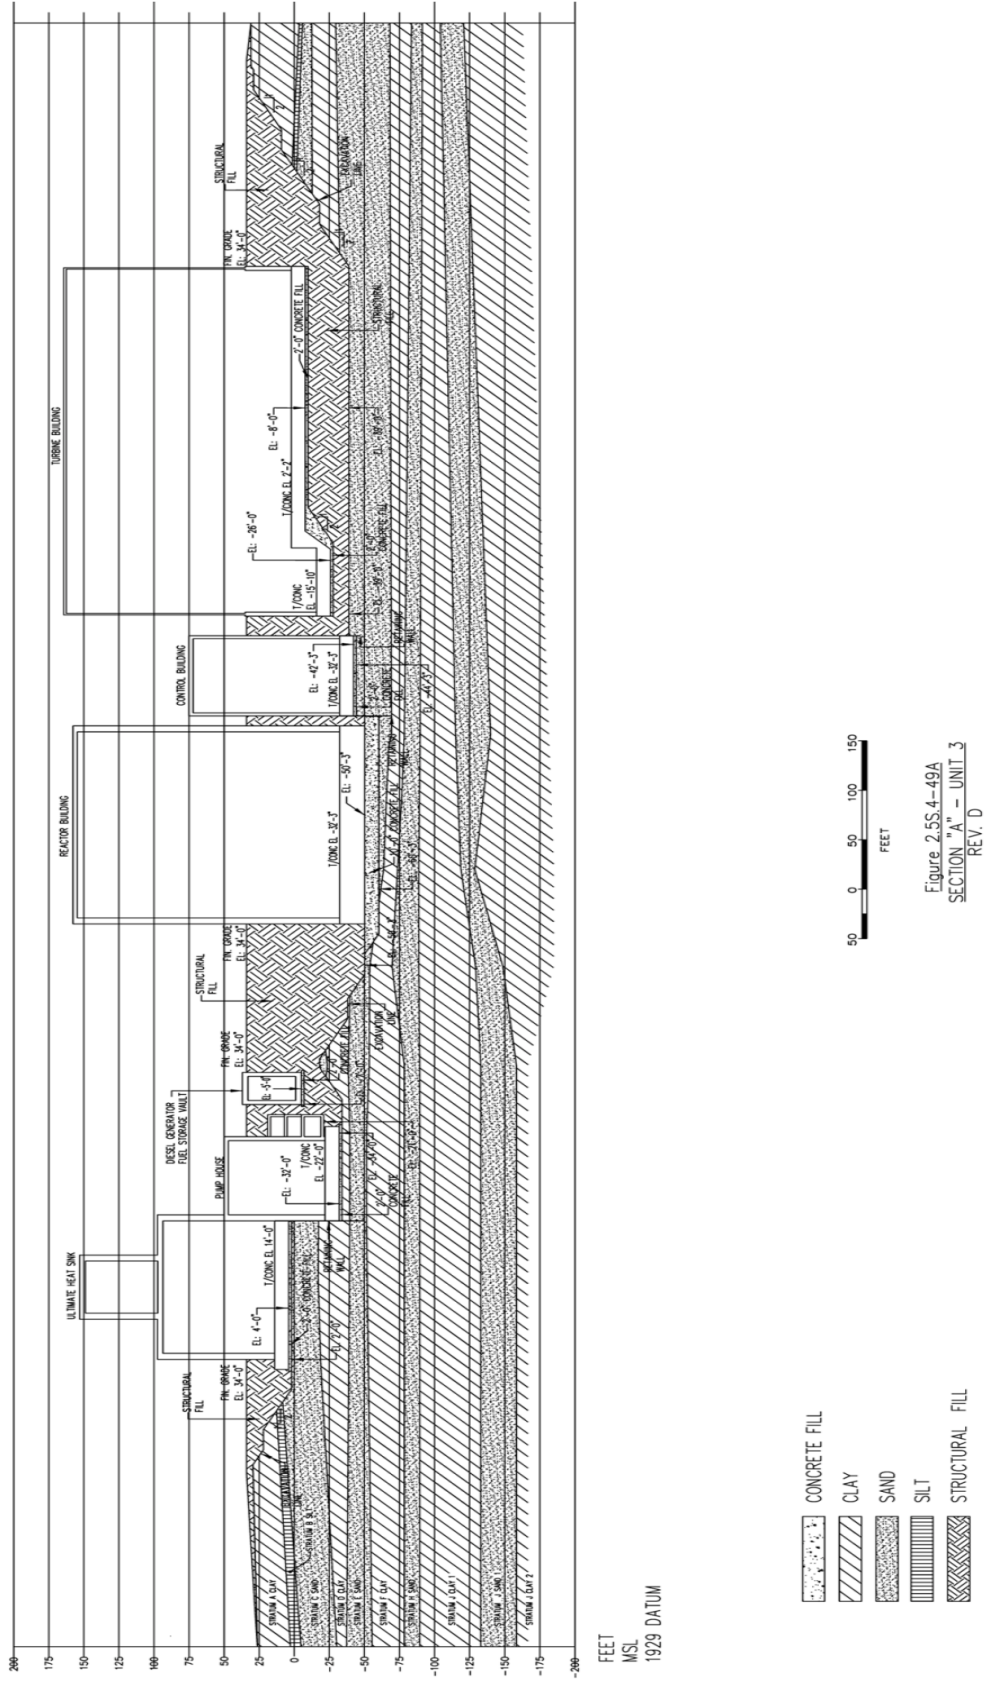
Section A Unit 3 (FSAR Figure 2.5S.4-49A)
